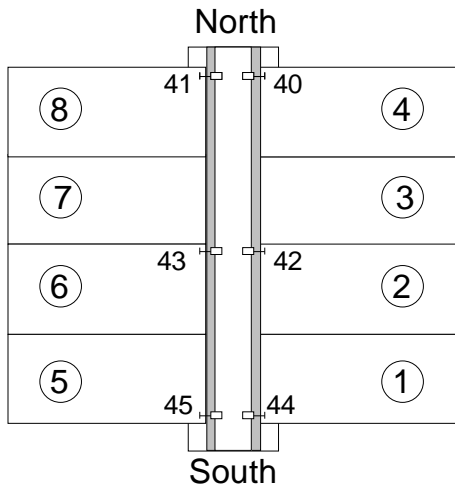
Transducers 40–45 measuring crack width on the top of the floor.
